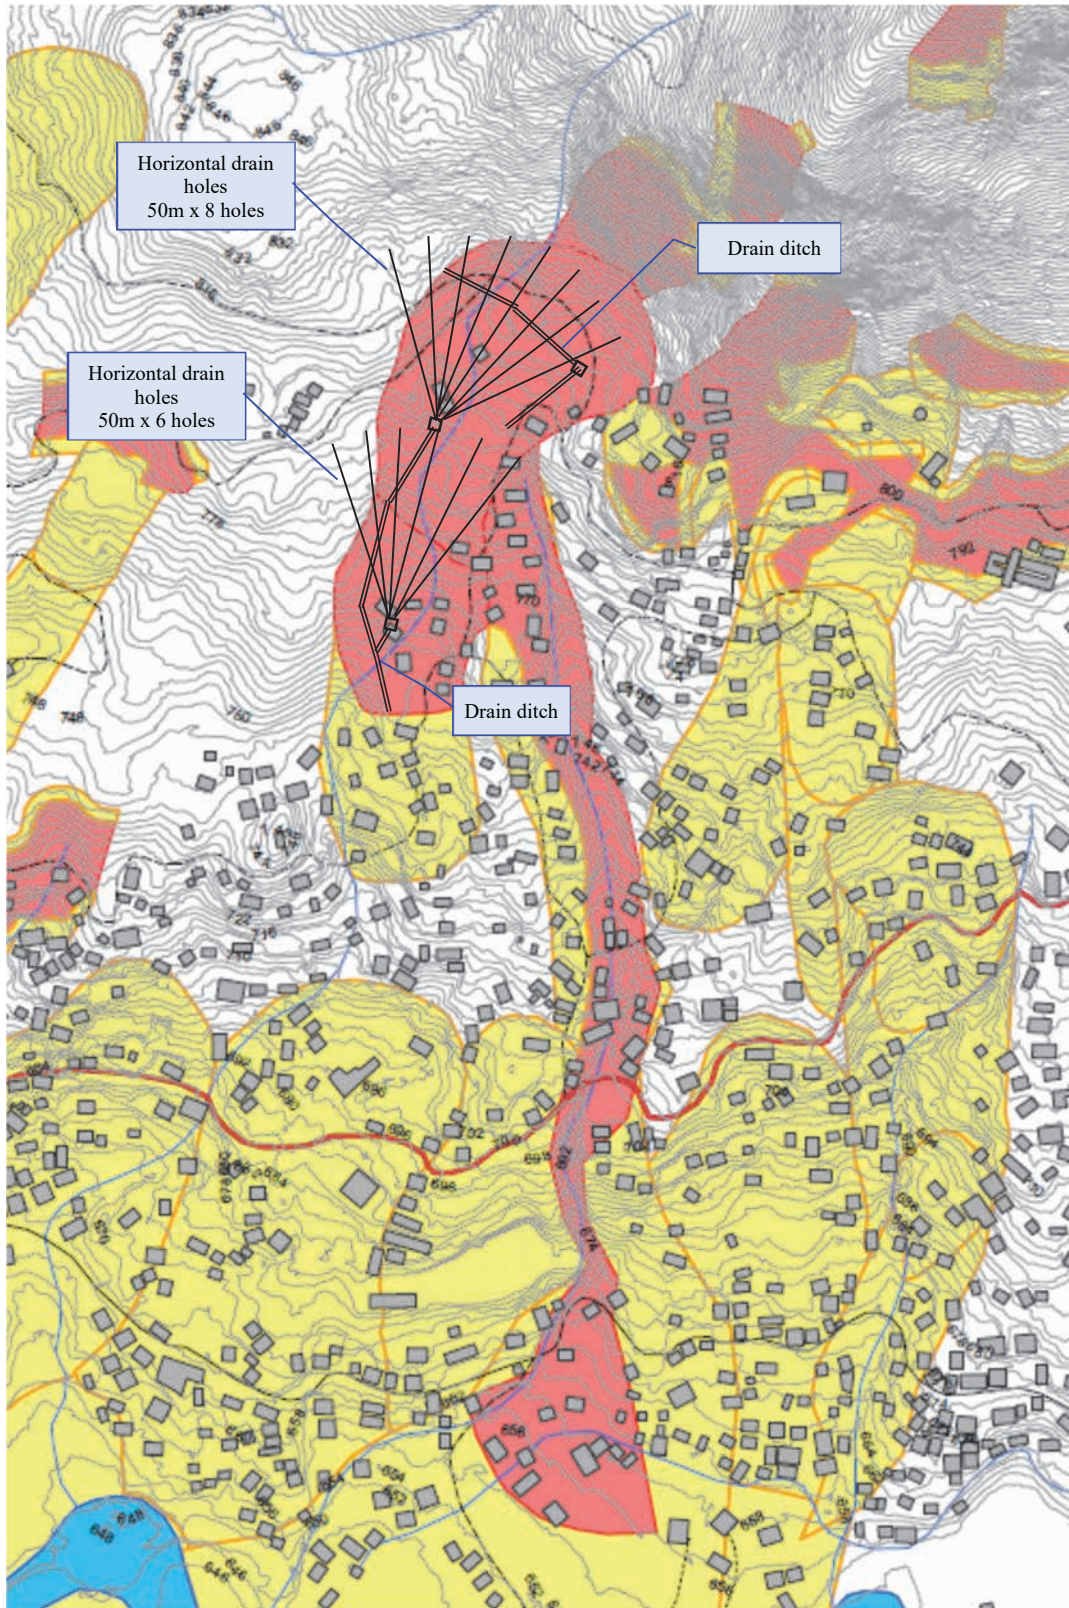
Layout of the Planned Structural Measures for Site 3 in the Weeriyapura Pilot Site
